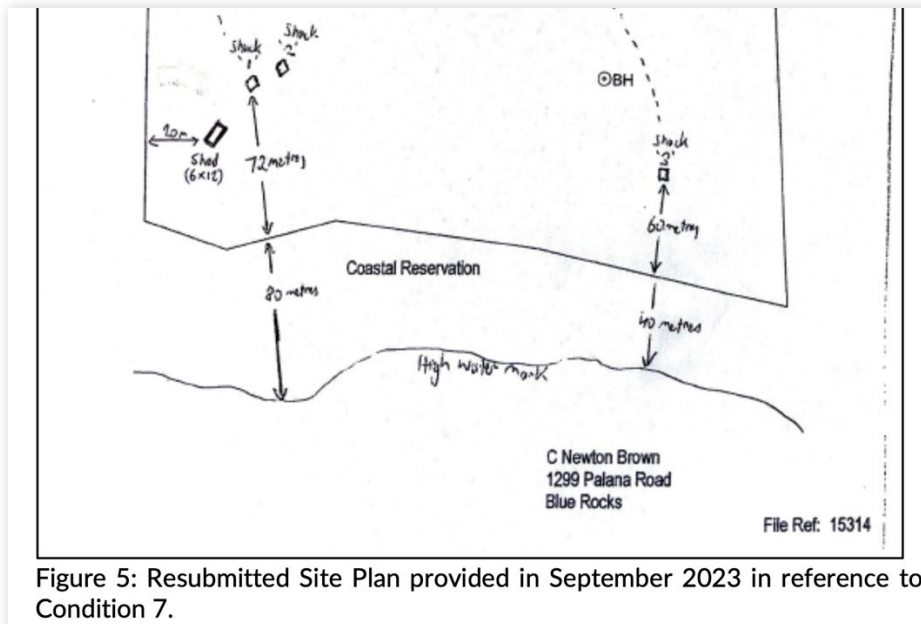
excerpt of the 2025 Minor Amendment Assessment showing the September 2023 resubmitted site plan with increased shed size determined not to be enforceable.
